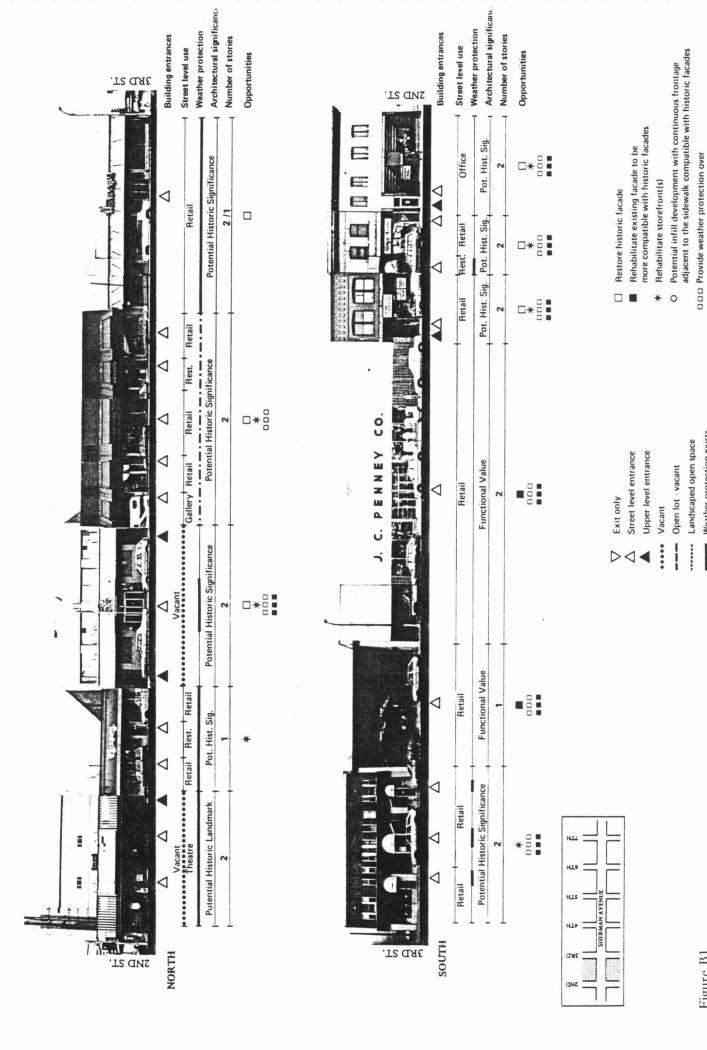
Sherman Avenue Block Elevations: 2nd Street to 3rd Street
